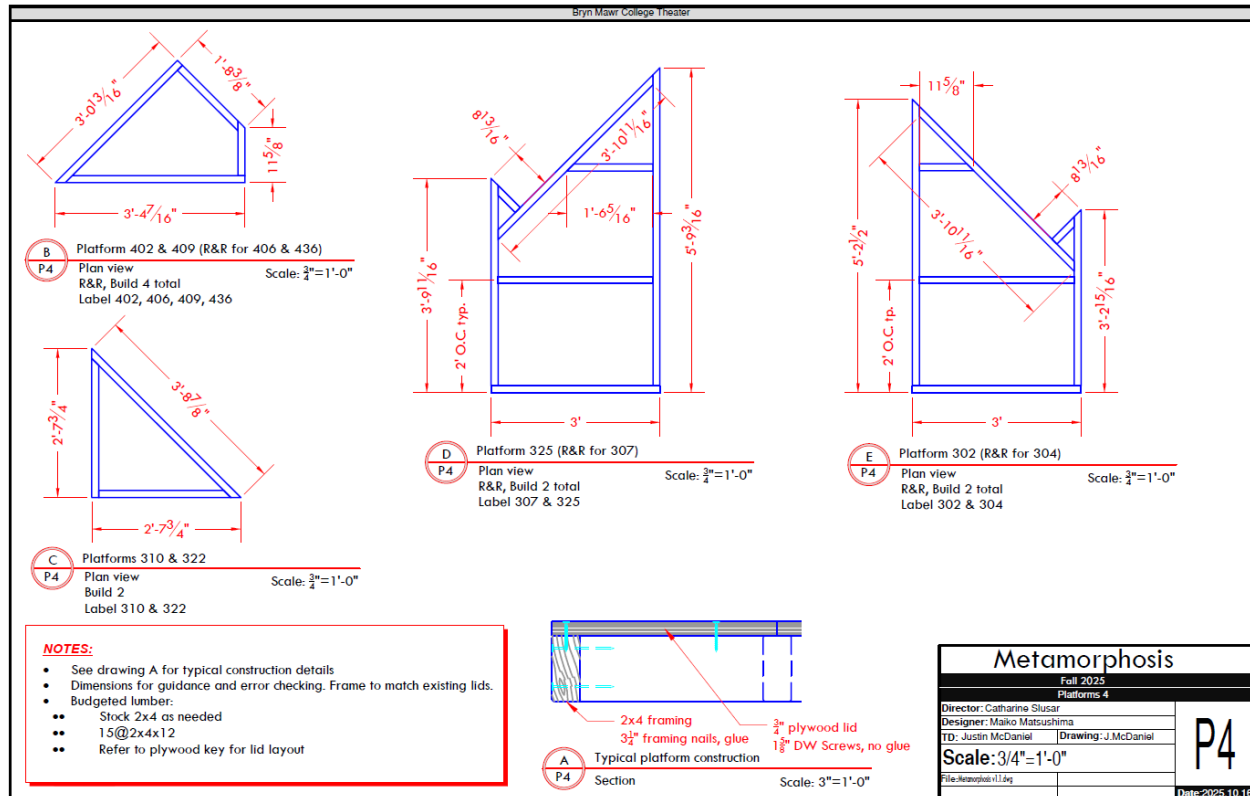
Working drawing example. Includes notes box and drawing label examples.
